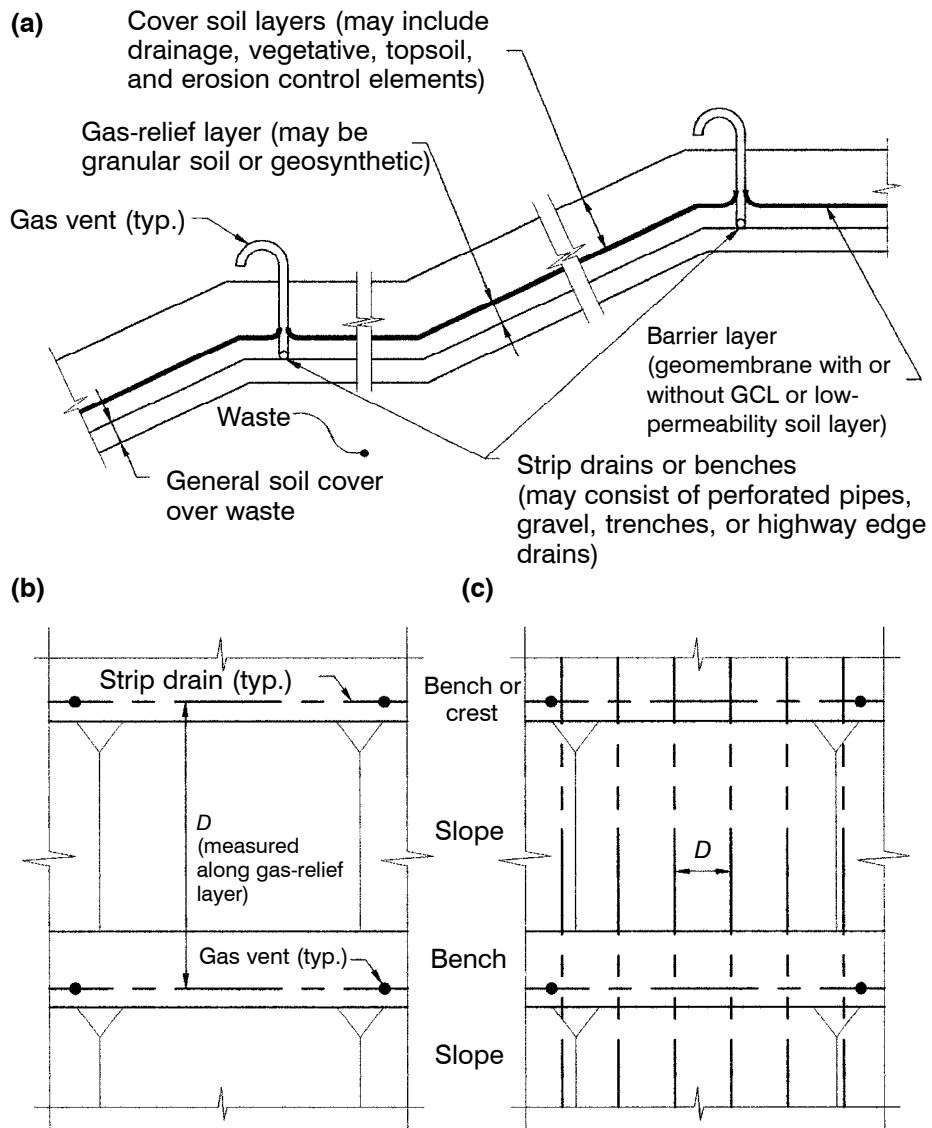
Schematic showing the design elements of the gas-relief layer: (a) profile of final cover with gas-relief layer and strip drains; (b) plan view of strip-drain layout on benches only; (c) plan view of strip-drain layout on slopes and benches.
